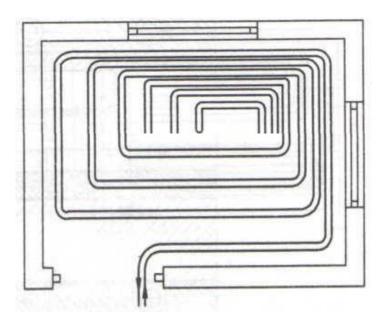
Floor Heating Application Detail (Anonim, 2007)
